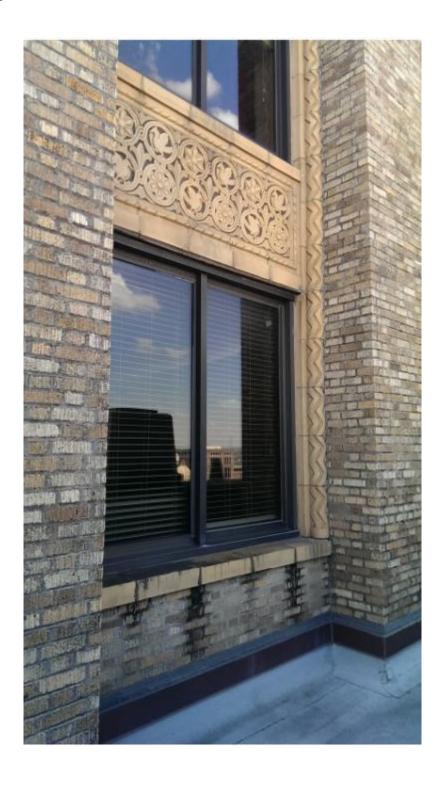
Exterior view of typical window at levels 17, 19, and 21
